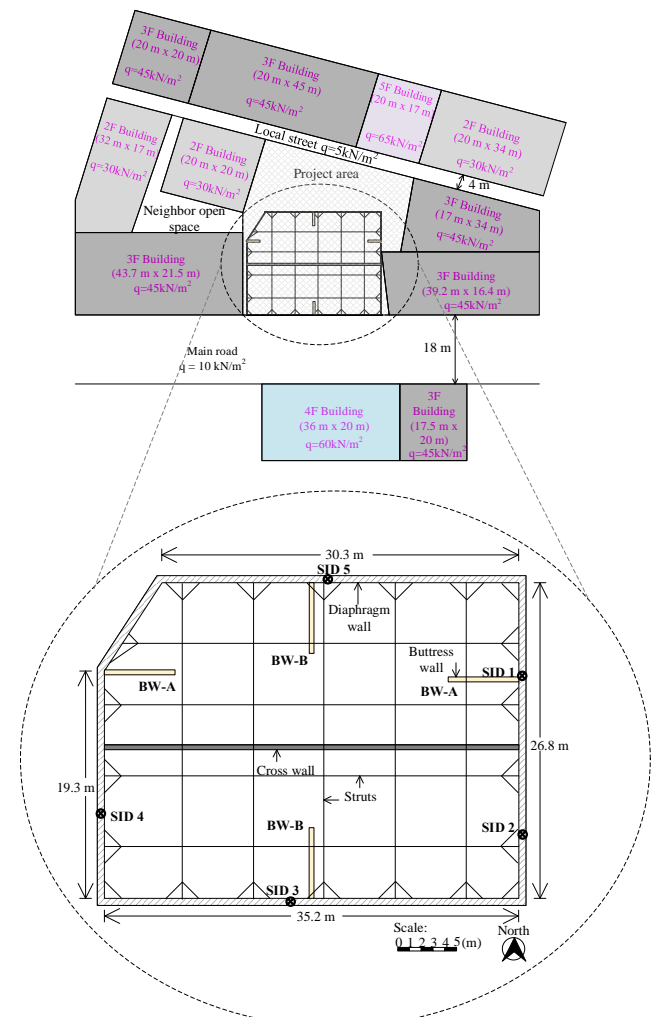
Excavation geometry, adjacent buildings, and instrumentation for Case 1
